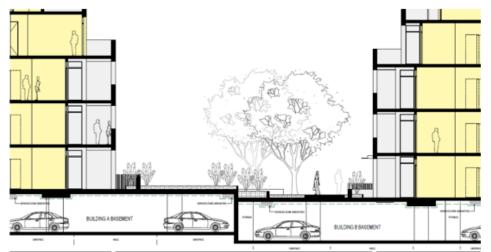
Cross section showing proposed landscaping above basement. The plan fails to provide information relating to soil volumes and depth and shows limited space for soil above the basement.
